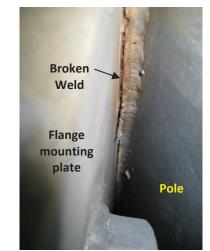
Broken weld at flange mounting plate to pole connection
